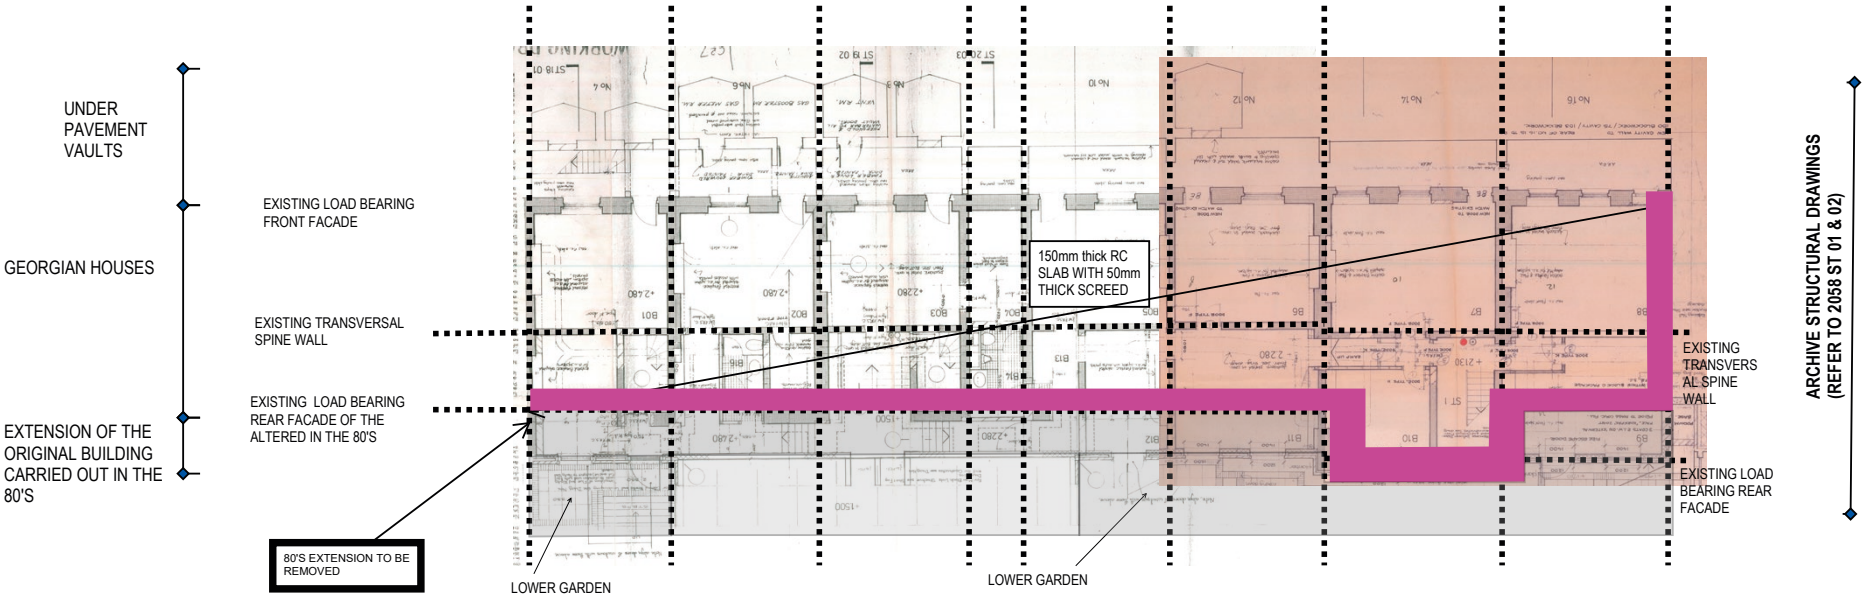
Underpinning extent along St. Thomas Street; Georgian Terrace buildings No. 04 to 16 (assuming piling from proposed B1 Level)
